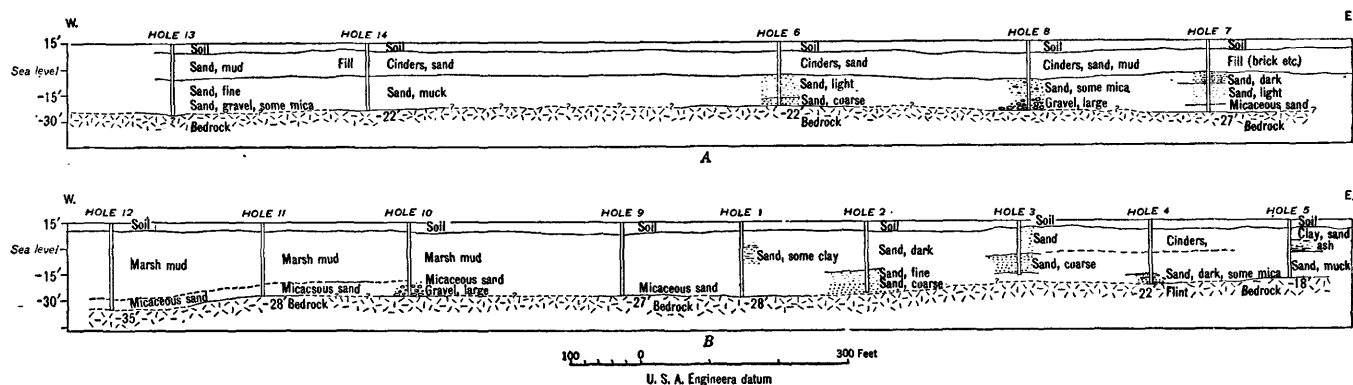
Sections through boreholes at site of Munitions Building and Navy Department Building, 1918. A, 350 feet south of Constitution Avenue; B, 600 feet south of Constitution Avenue.
